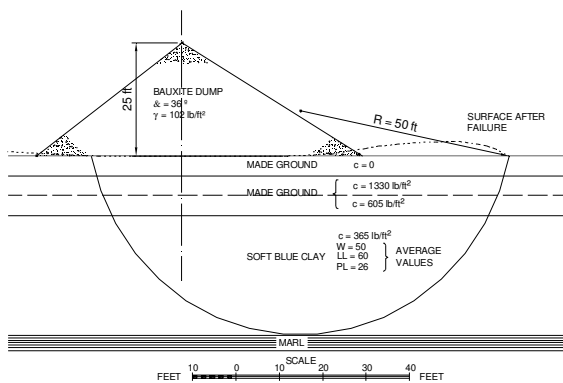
Failure of a Bauxite Dump at Newport (after Skempton and Golder; 1948)
